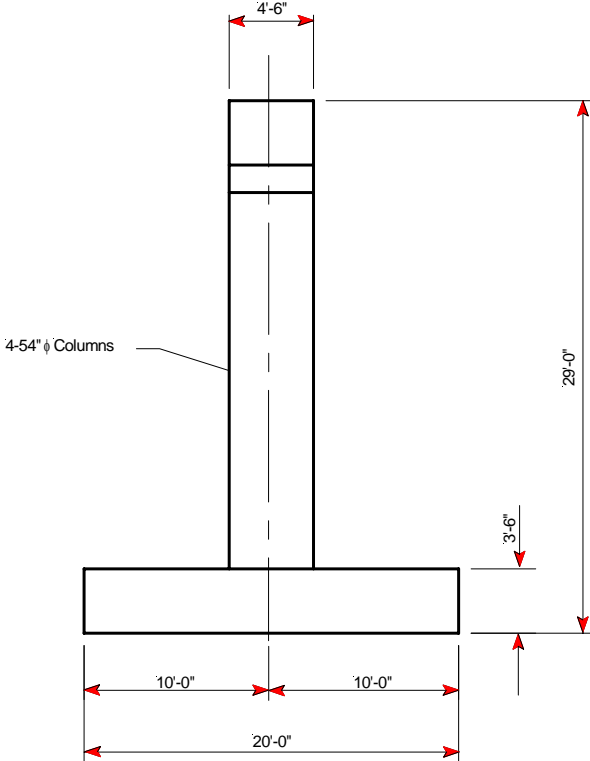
Transverse Pier Elevation (Tutorial 2)
